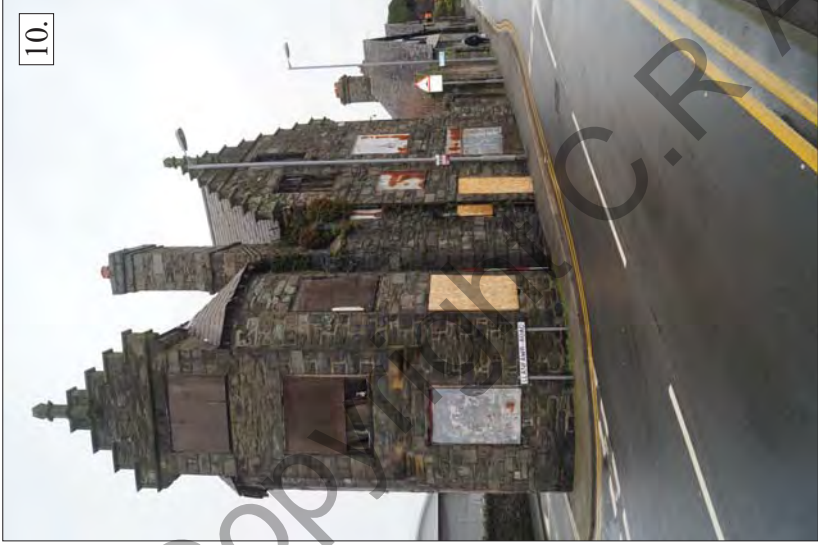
North-East Facing View Along Turkey Shore Road from Plas Alltran
